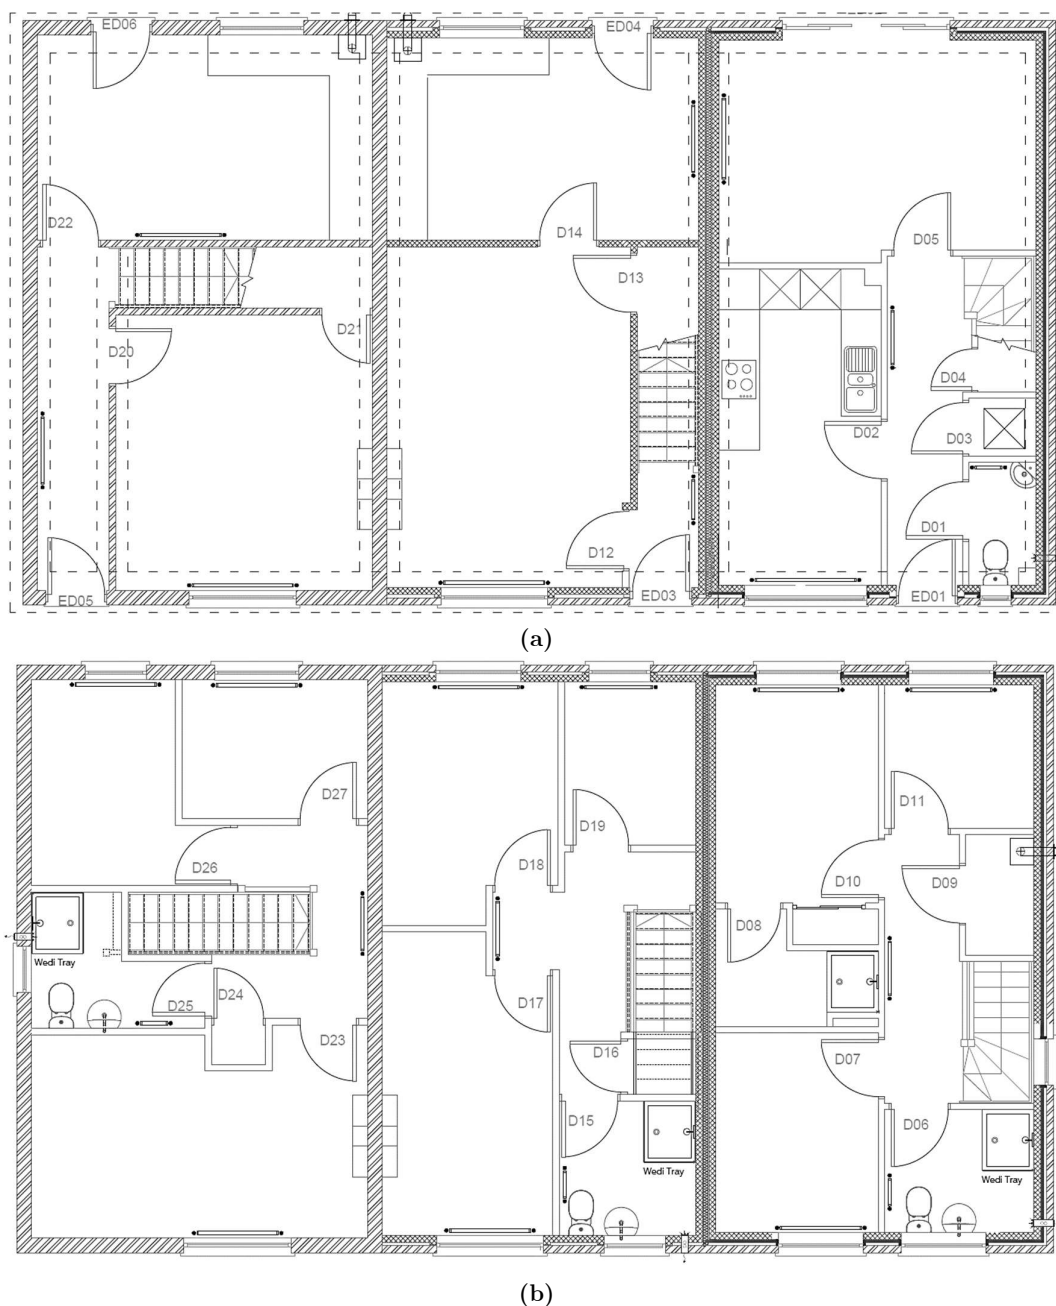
Layout of the case study for fuel poverty example, 1930s house on the left, 1970s house in middle and 2010s house on the right; a) Ground floor, b) First floor
